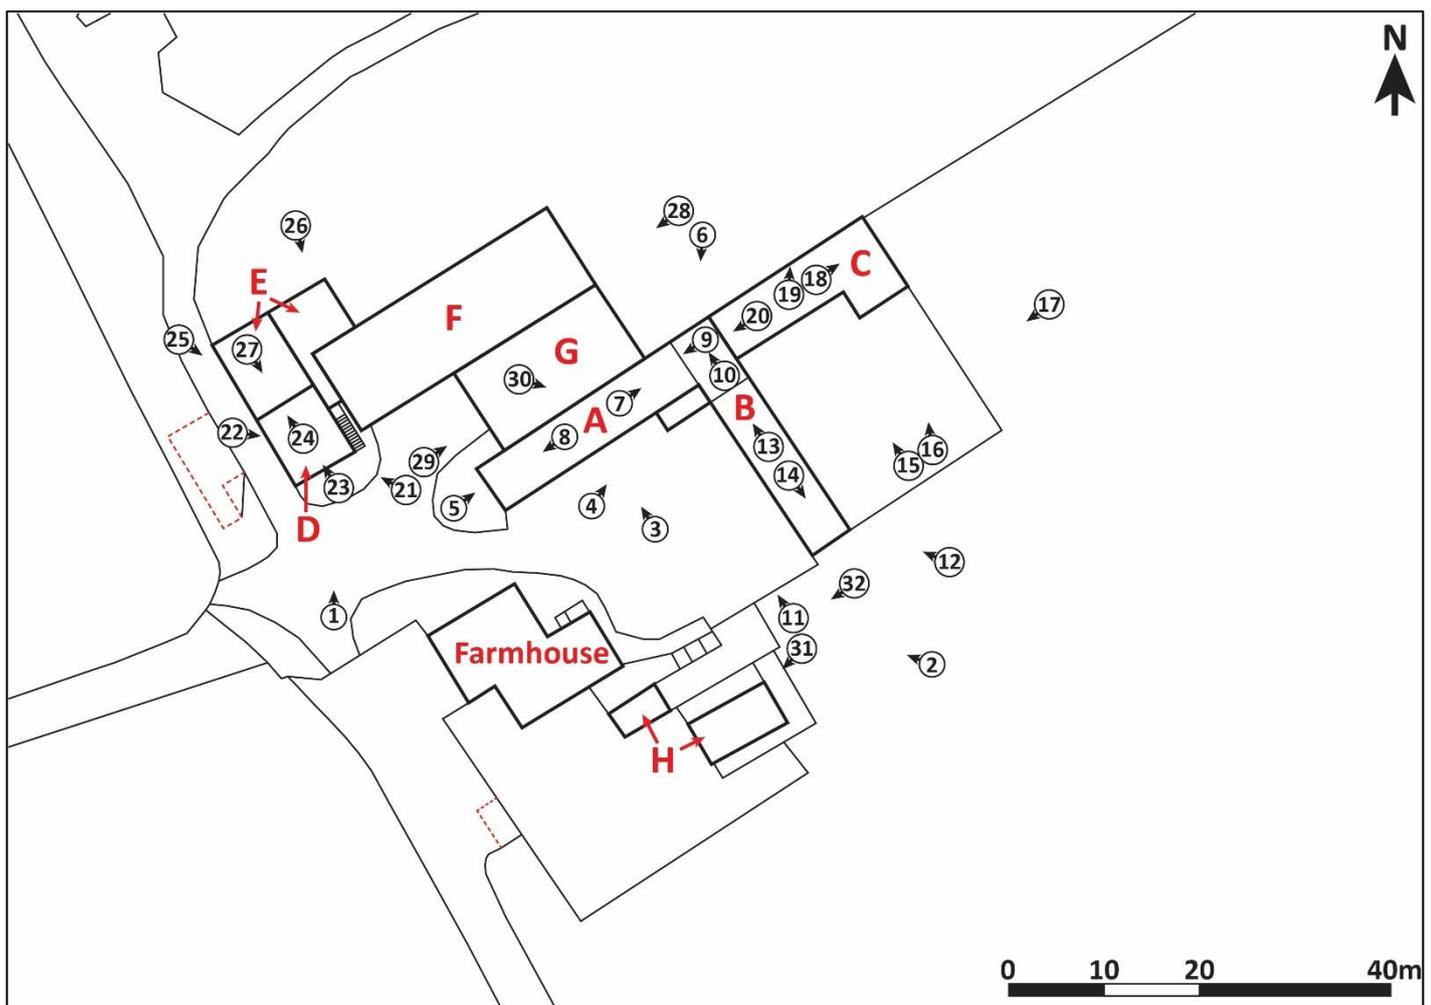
Plan of outbuildings at Gannah Farm showing location of photographs taken
